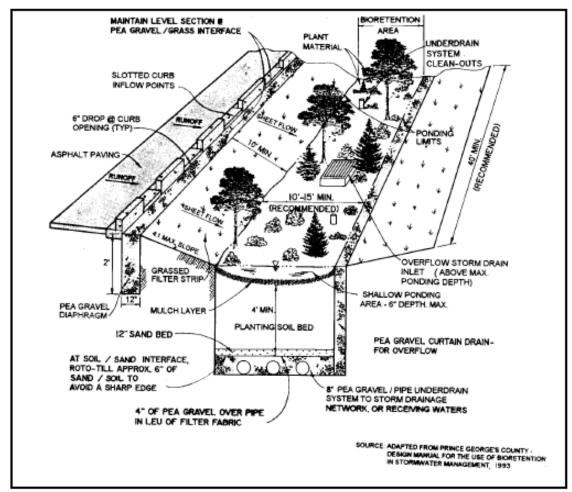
Typical Bioretention Area (Source: Claytor and Schueler. 1996. Center for Watershed Protection.)
